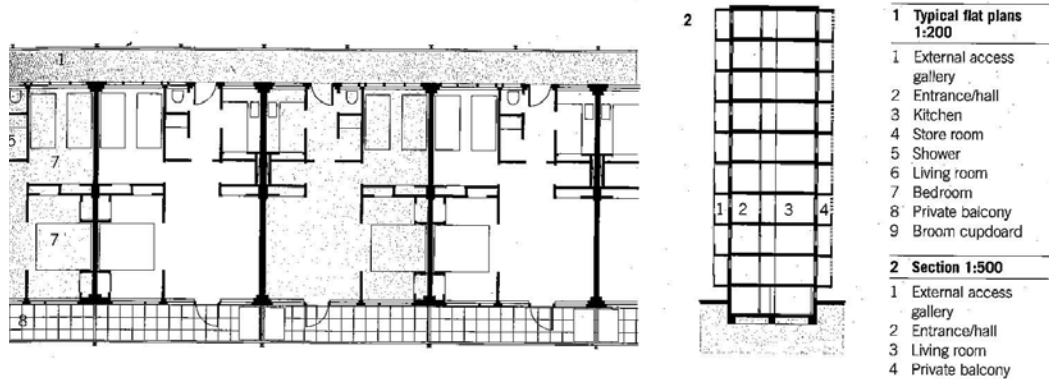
Bergpolder Building Apartment Unit Plan and Section⁷
